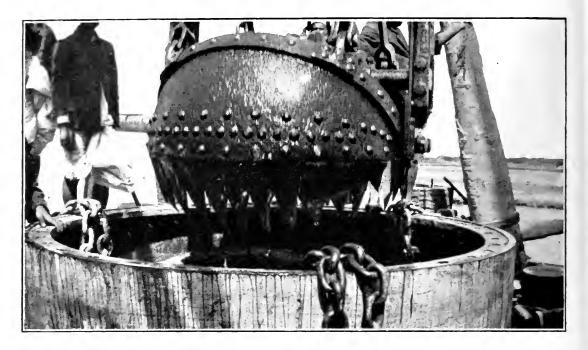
Grab and Top of Cylinder, shewing Chains for Weighting Cylinder.
